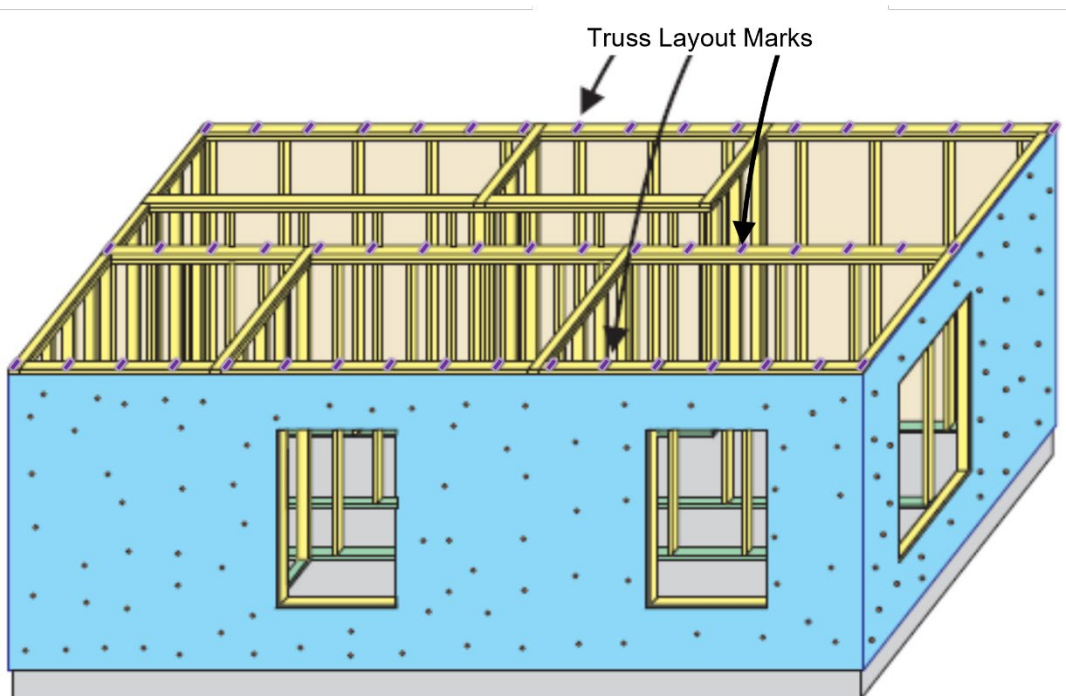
Mark the Truss Layout on Top of the Cap Plate
